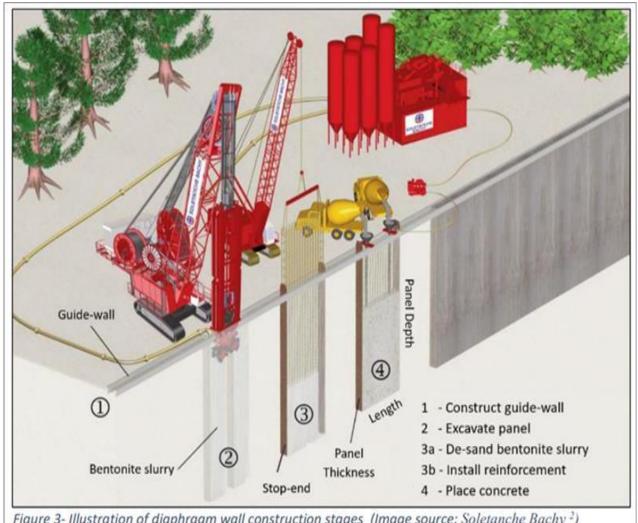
Illustration of diaphragm wall construction stages (Image source: Soletanche Bachy 2)
